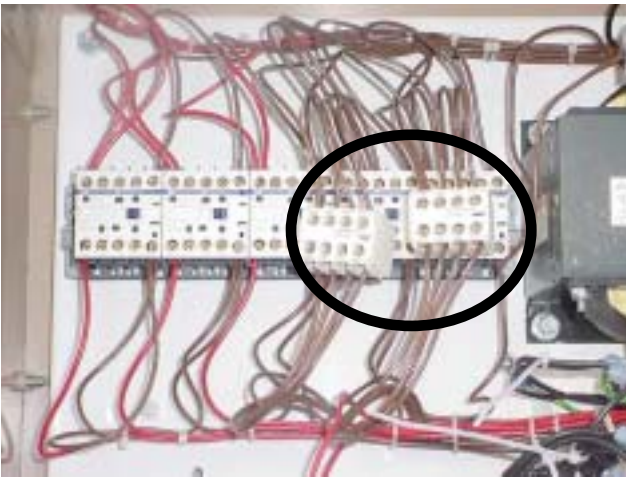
12R & 13R AUXILIARY CONTACT BLOCKS
